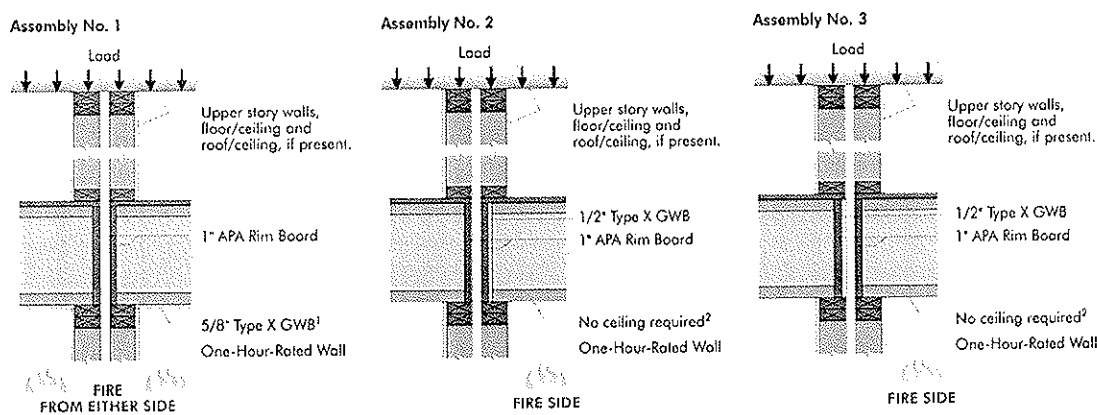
One-hour fire-rated rim board assemblies with load transfer
